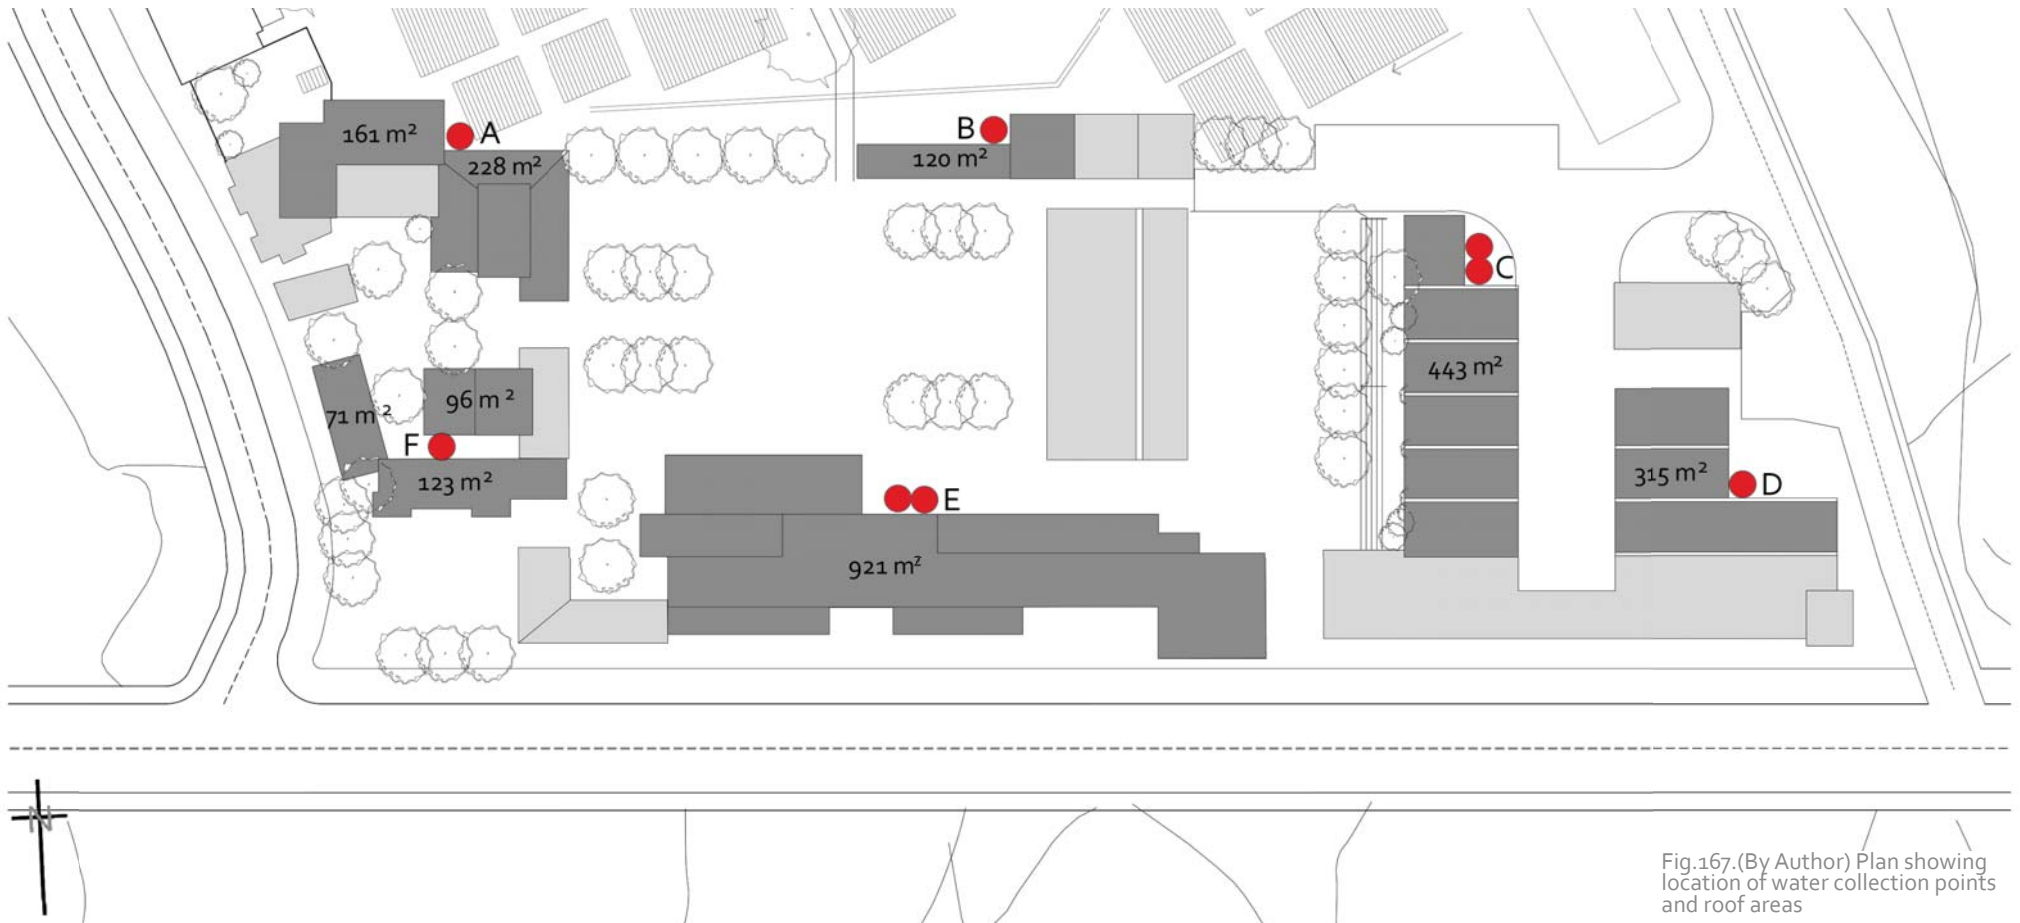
(By Author) Plan showing location of water collection points and roof areas
